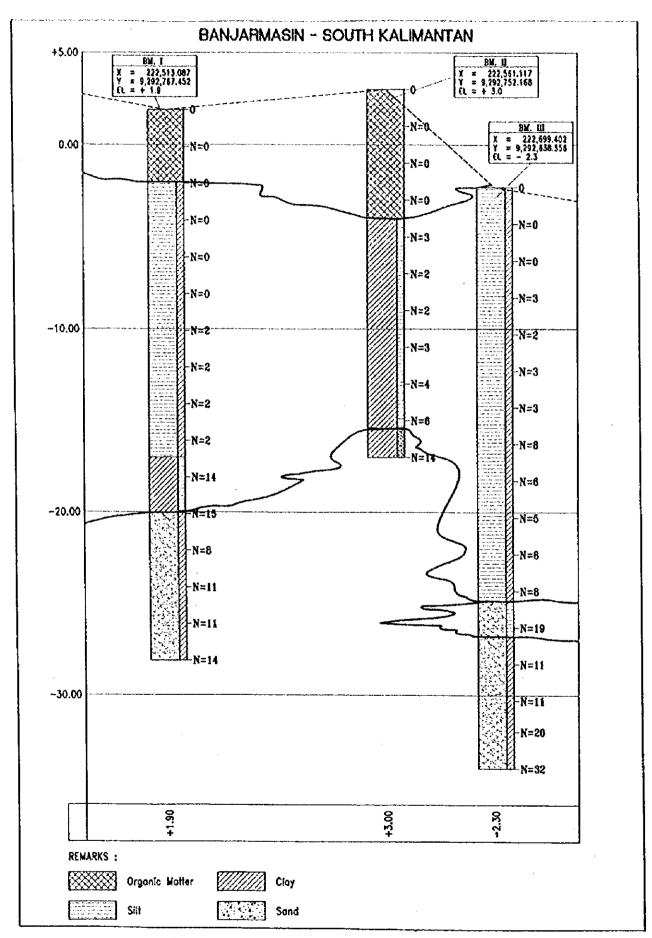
Soil Profile of Banjarmasin Bay Site
